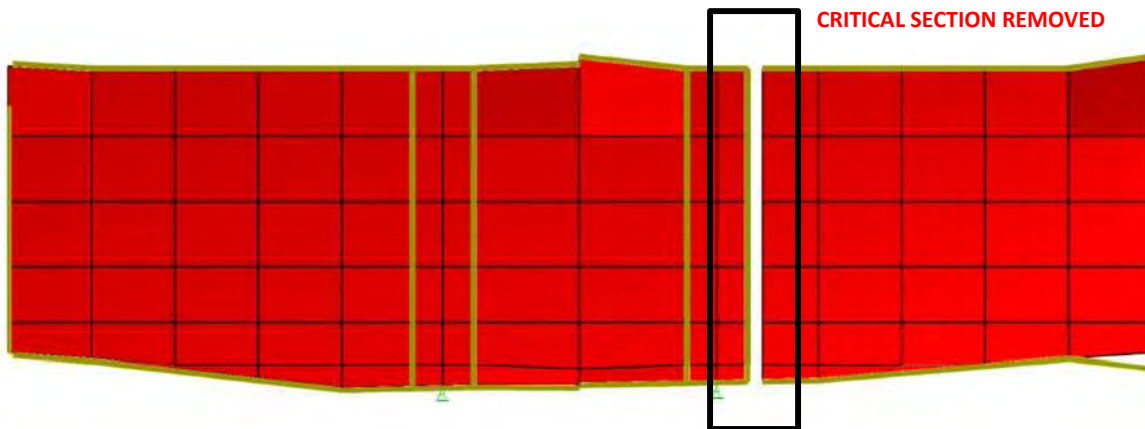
Location of Fracture in Damaged Condition at Integral Pier Cap
